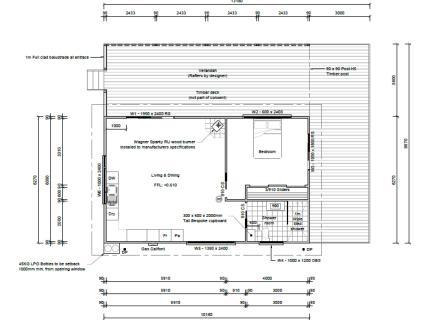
Proposed Floor Plan from Architectural Drawings, Appendix II
